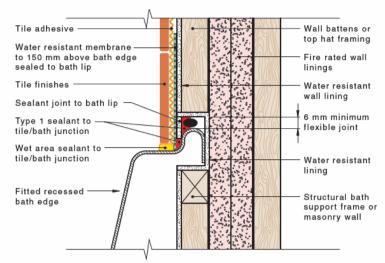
(E) — Bath with no shower over it — Fitted bath — Fire rated framed wall
